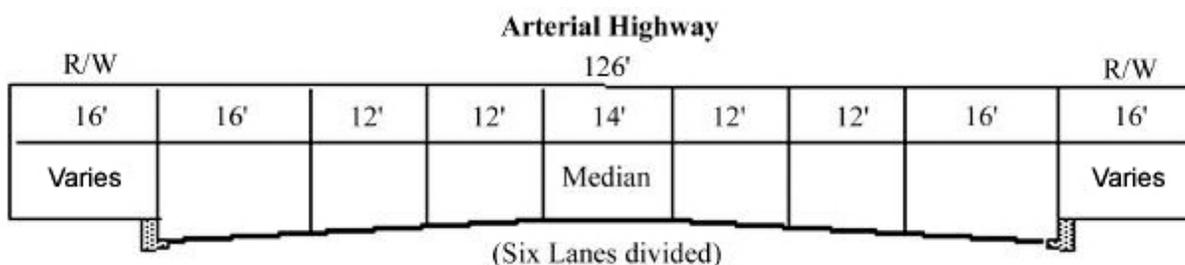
Existing Conditions Typical North of Ramon Road
